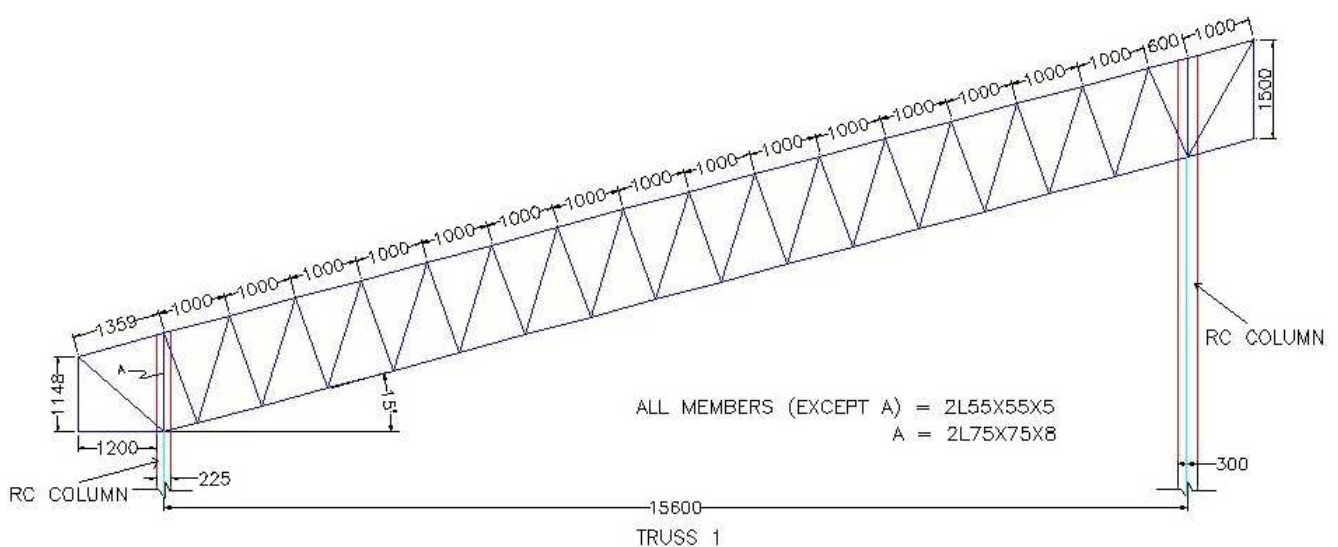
Selected Truss Showing Member Sections and Dimensions (mm).
